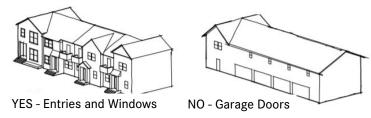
The front facade shall be dominated by entries and landscape, not garage doors.
